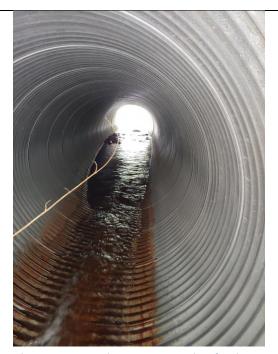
South Crossing Inside of Culvert, Southeast View from Inlet
